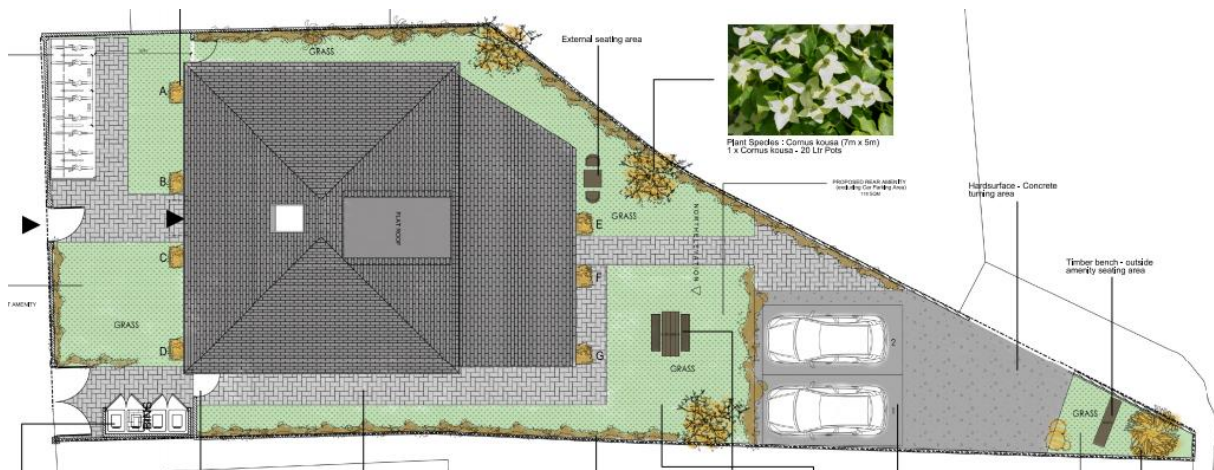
REFUSED SCHEME (24469/APP/2021/4075) site layout landscaping plan extract (for comparison purposes)
